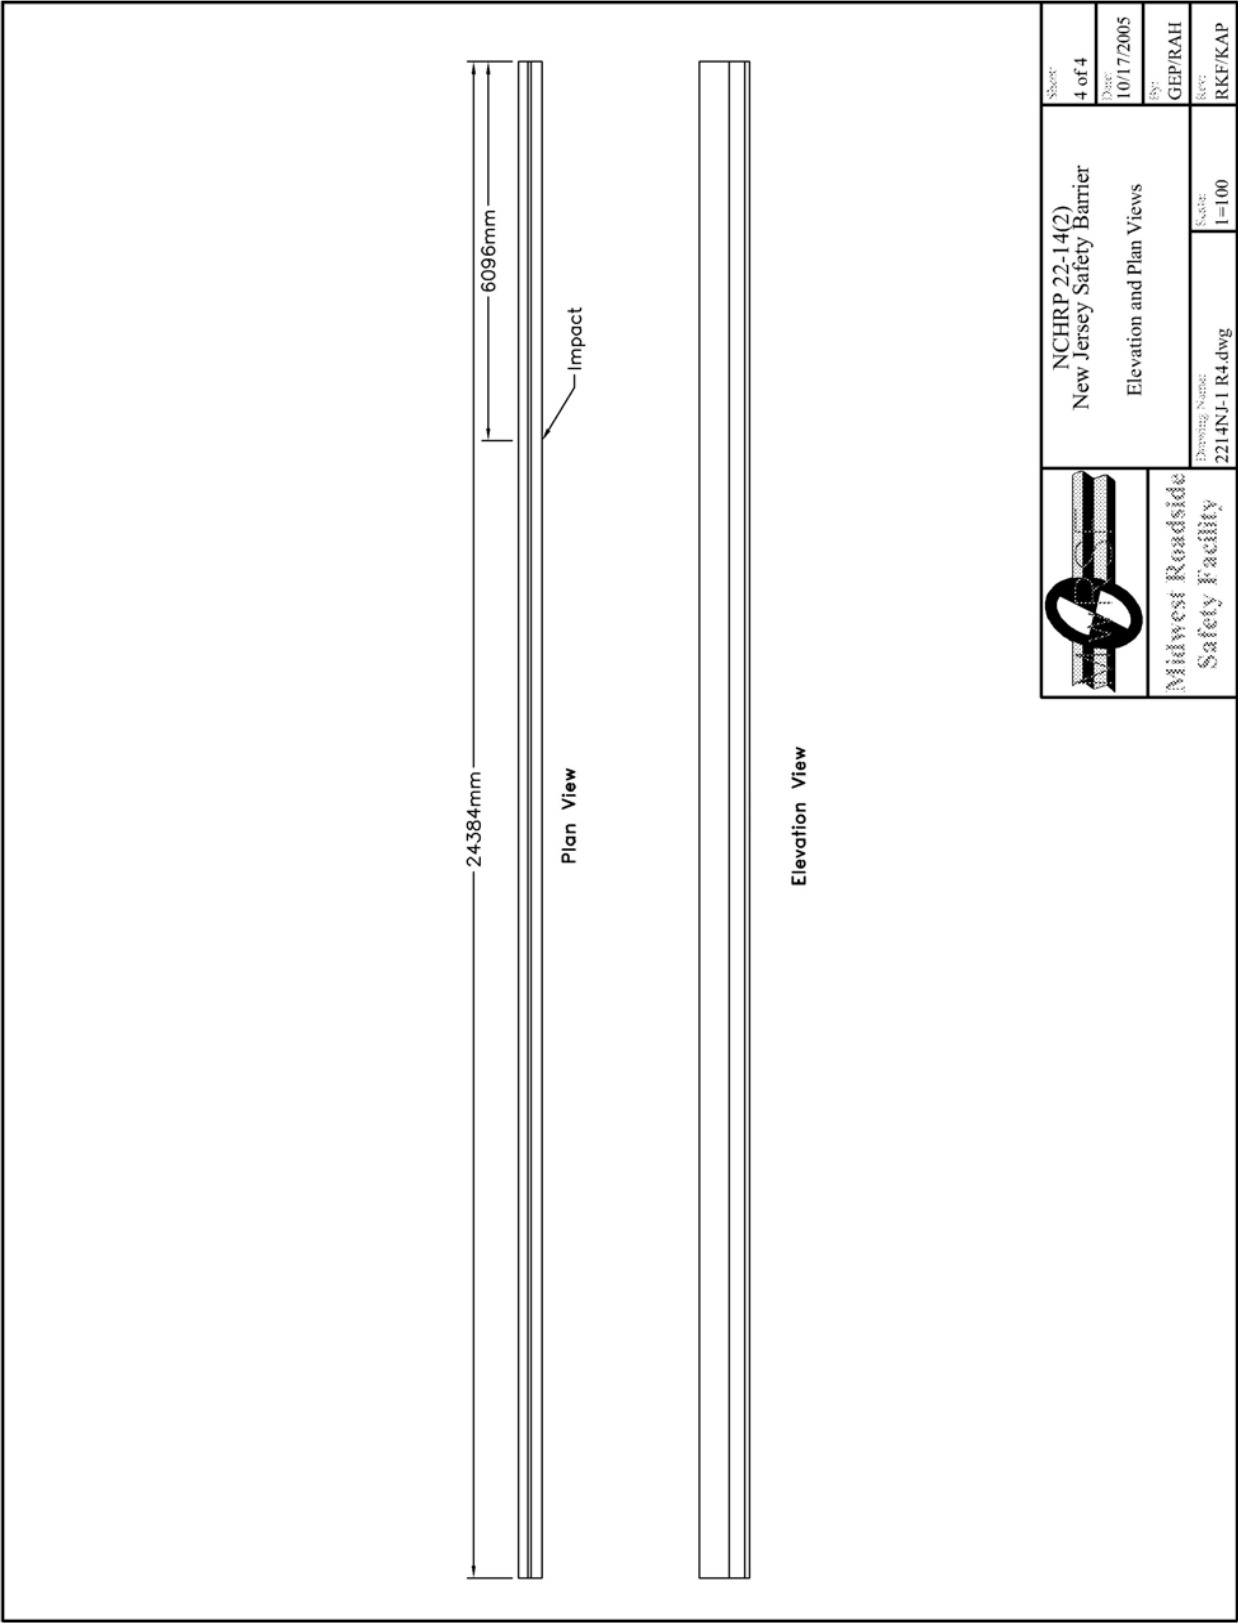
Layout of Permanent New Jersey Safety Shape Barrier
